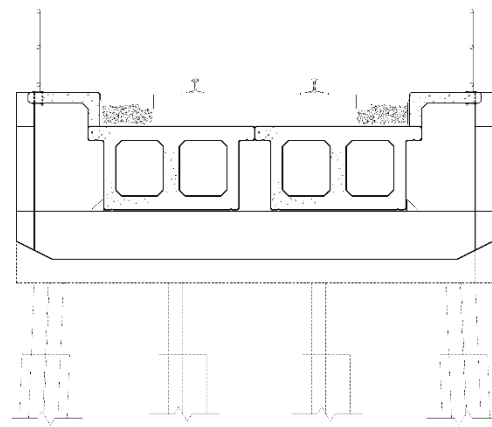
, 30" & 42" Ballast Deck Double Cell Span Section
